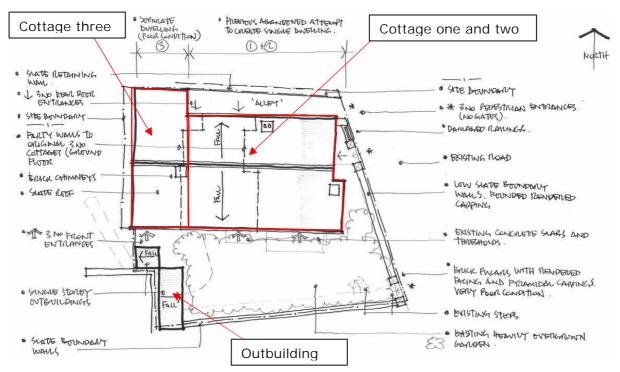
Plan taken from planning portal identifying the sections of building discussed
